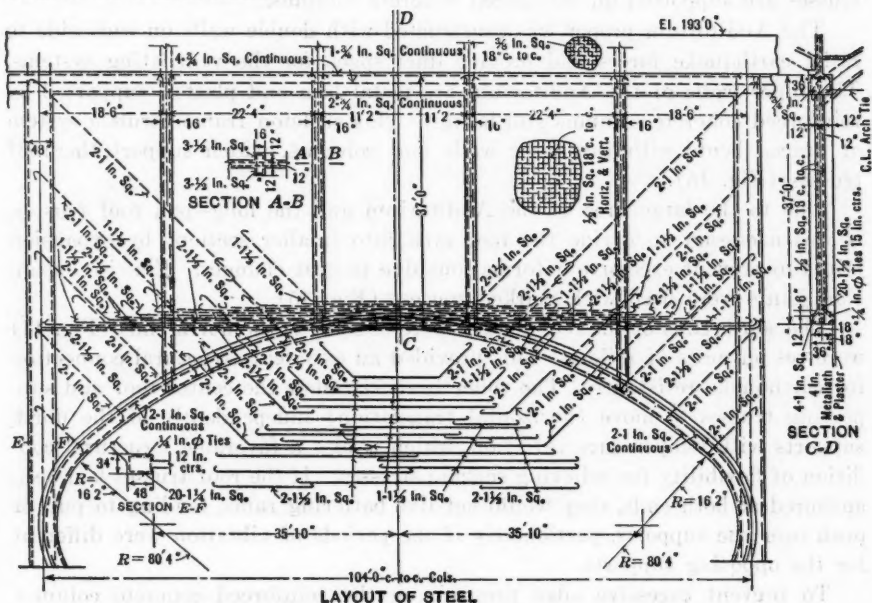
DETAILS OF REINFORCING PROSCENIUM ARCH.
